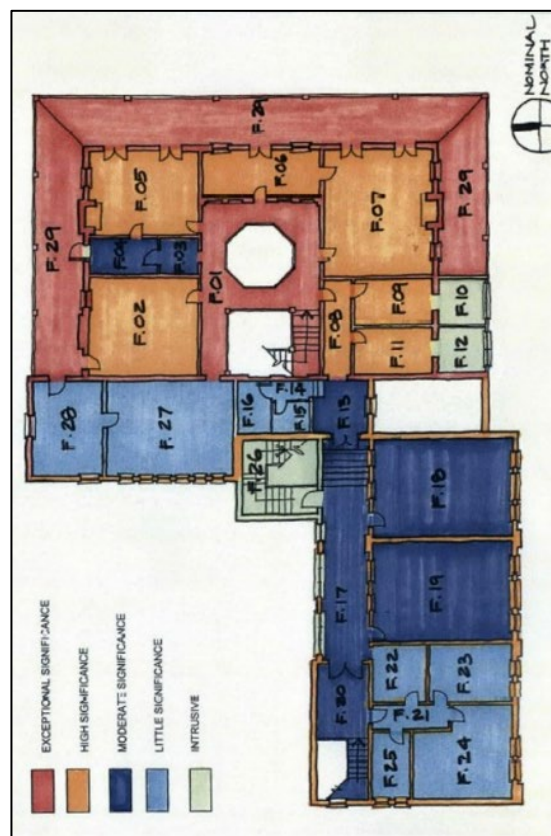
Significance Plan of First Floor Pallister House as set out in the CMP 2004
